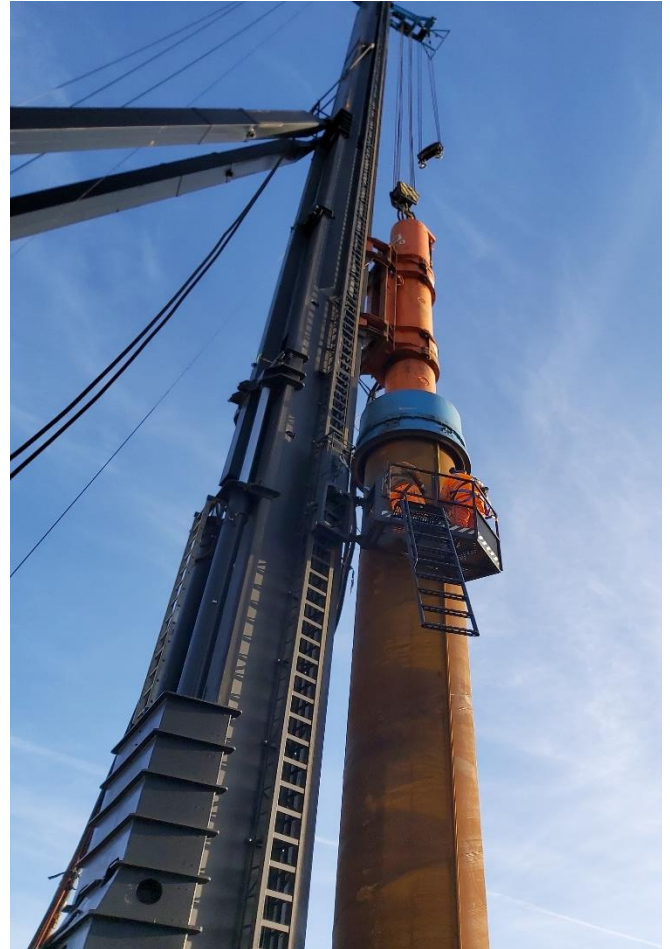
Combi-wall pile installed to final depth using hydraulic hammer (photo personally taken).
